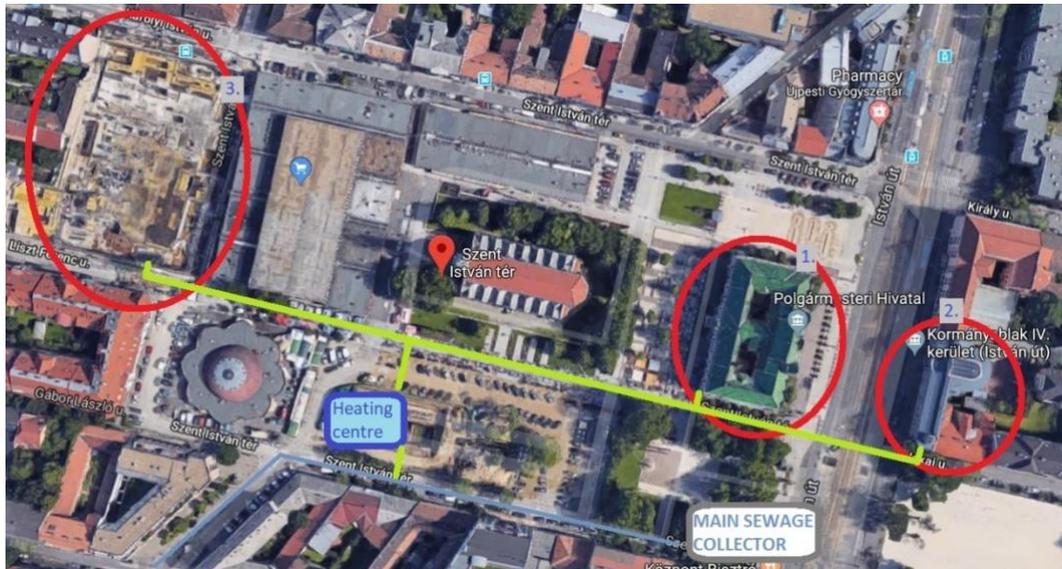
, Location of the construction site, the underground heating centre and the main sewage collector
